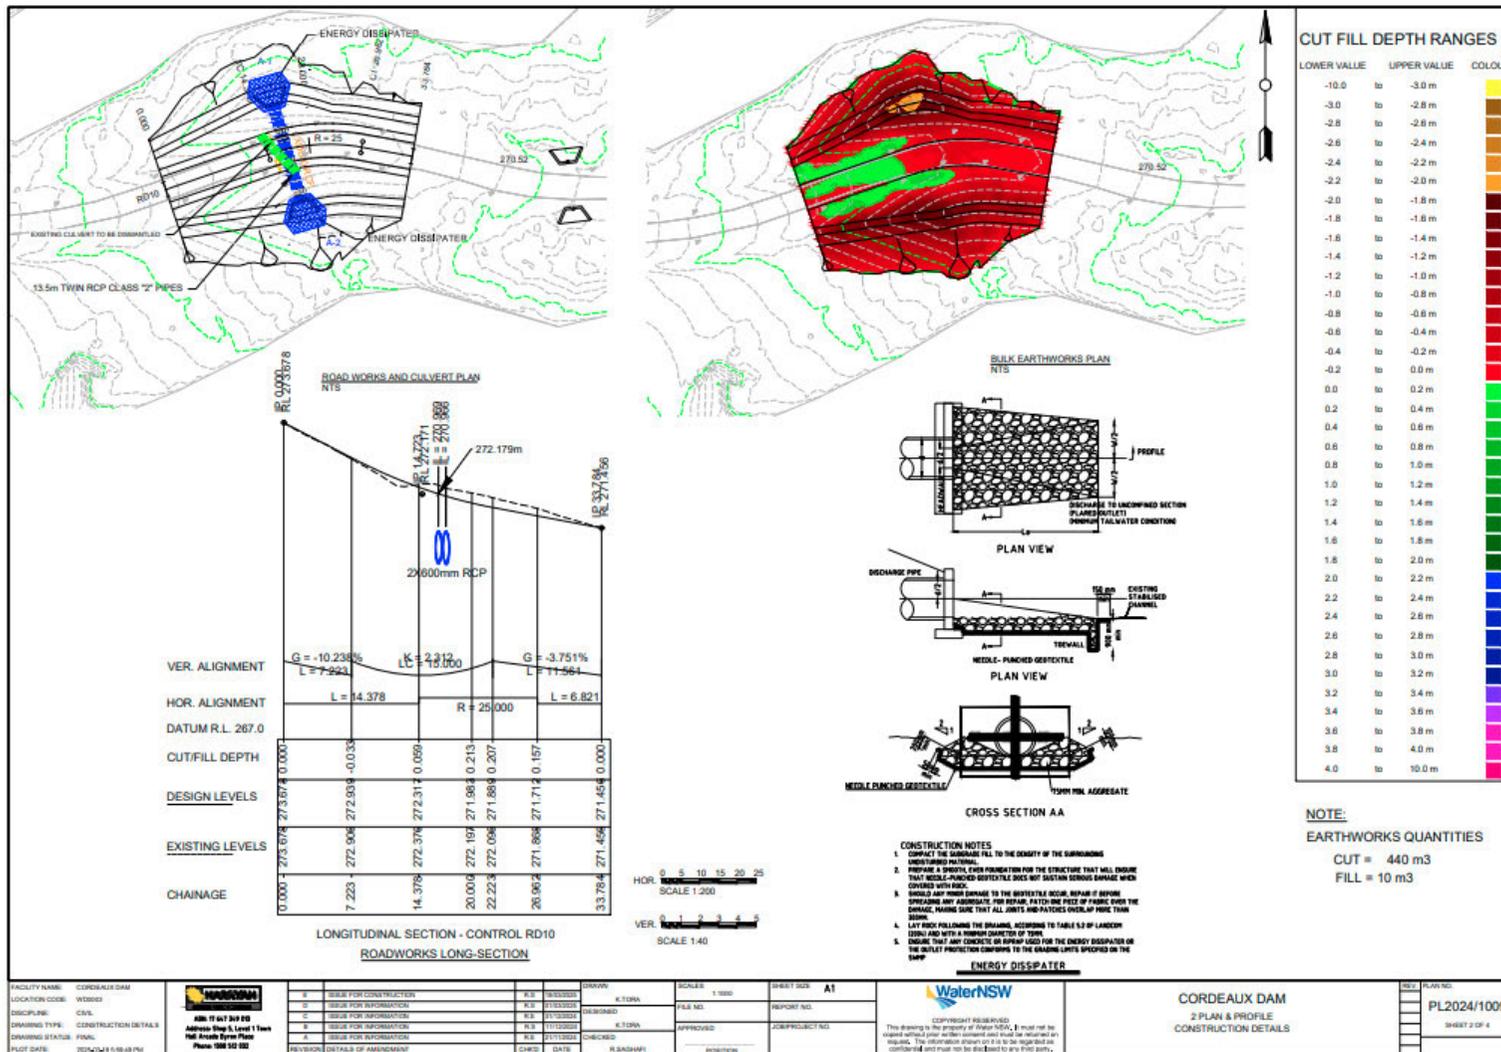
Culvert details in Area 4 (Source: Cordeaux Dam Construction Drawings, Water NSW)
